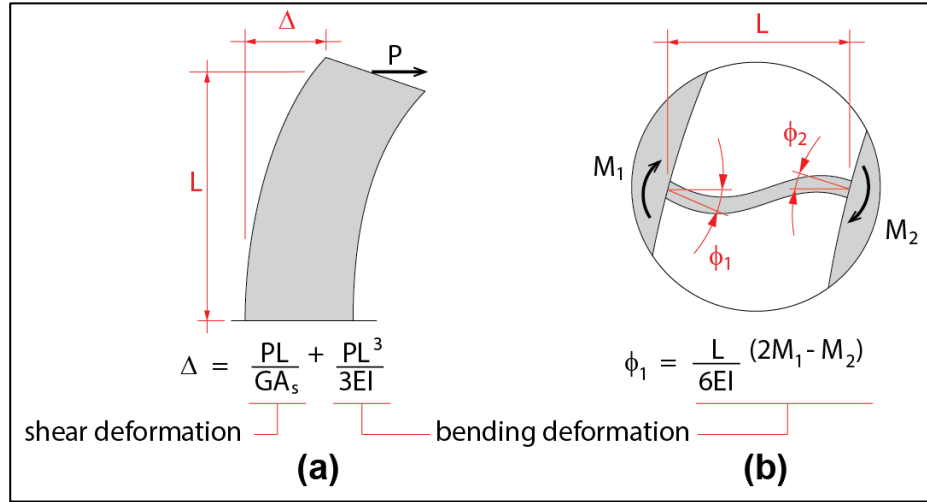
Deformation components for: (a) a cantilever wall; and (b) a slab between two walls
